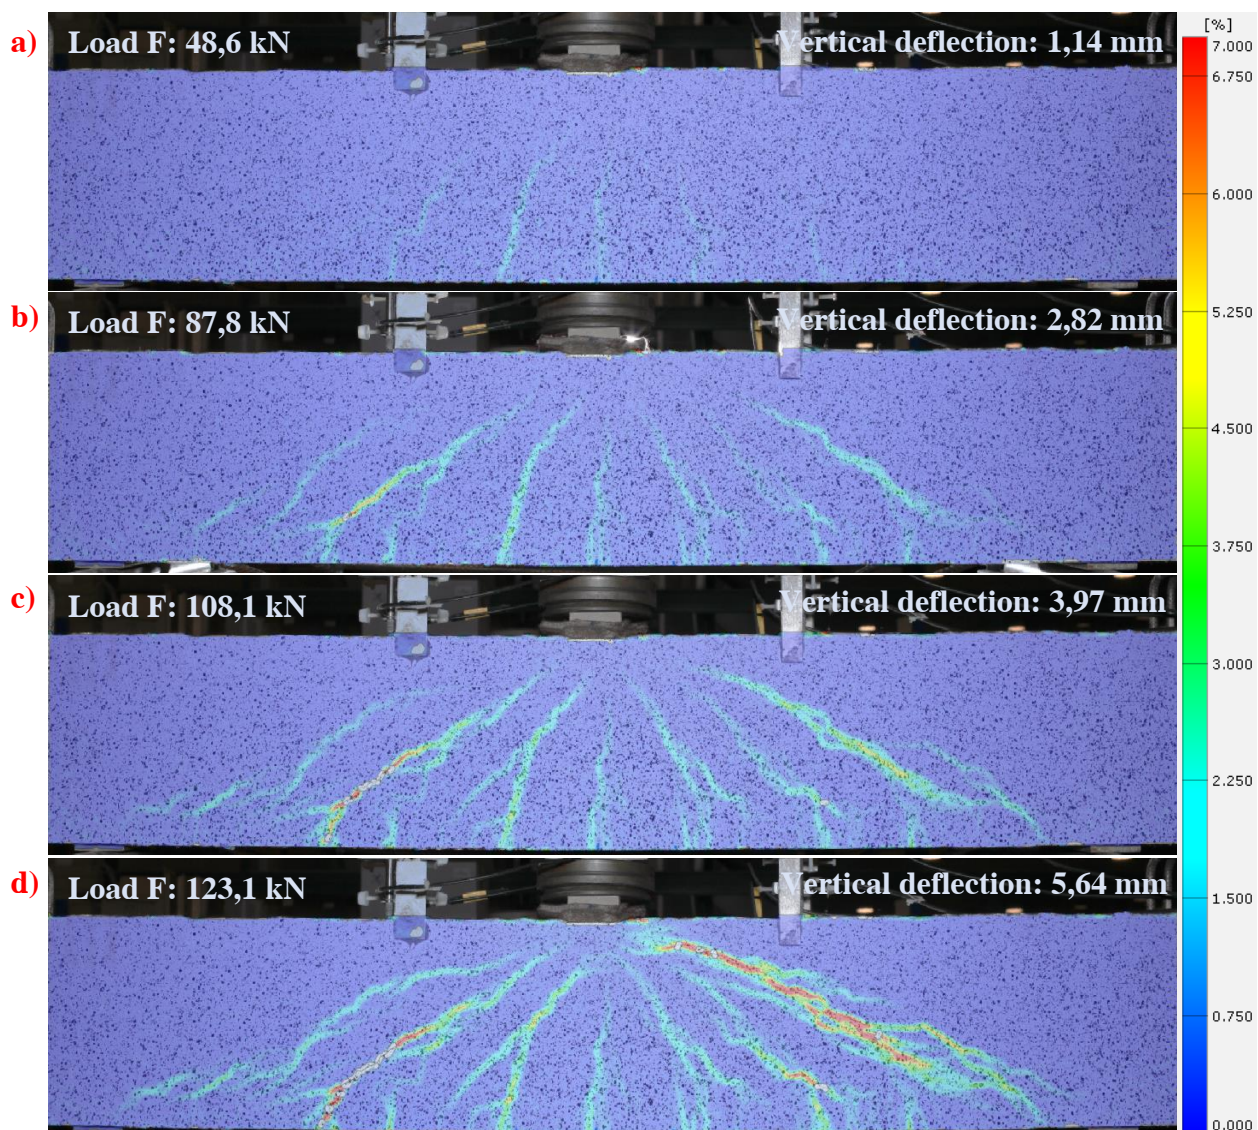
Crack pattern evolution in the hybrid beam B2 with shear reinforcement: major principle strain fields at various loading stages [front view]. a) full flexural crack pattern. b) inclination of cracks. c) formation of failure crack. d) the maximal load.
